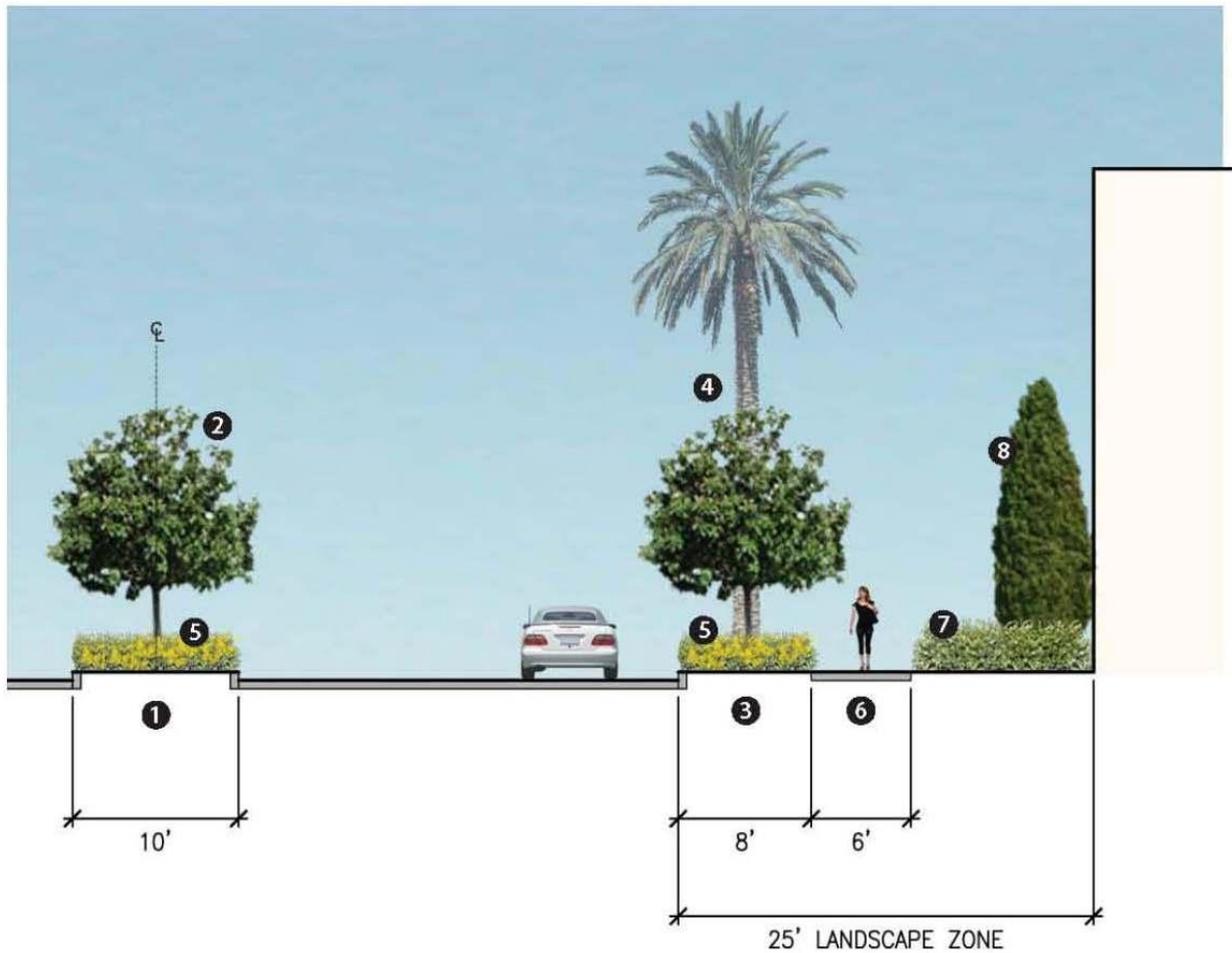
Internal Connector Road to First Intersection at Building Facade with Outdoor Patio
